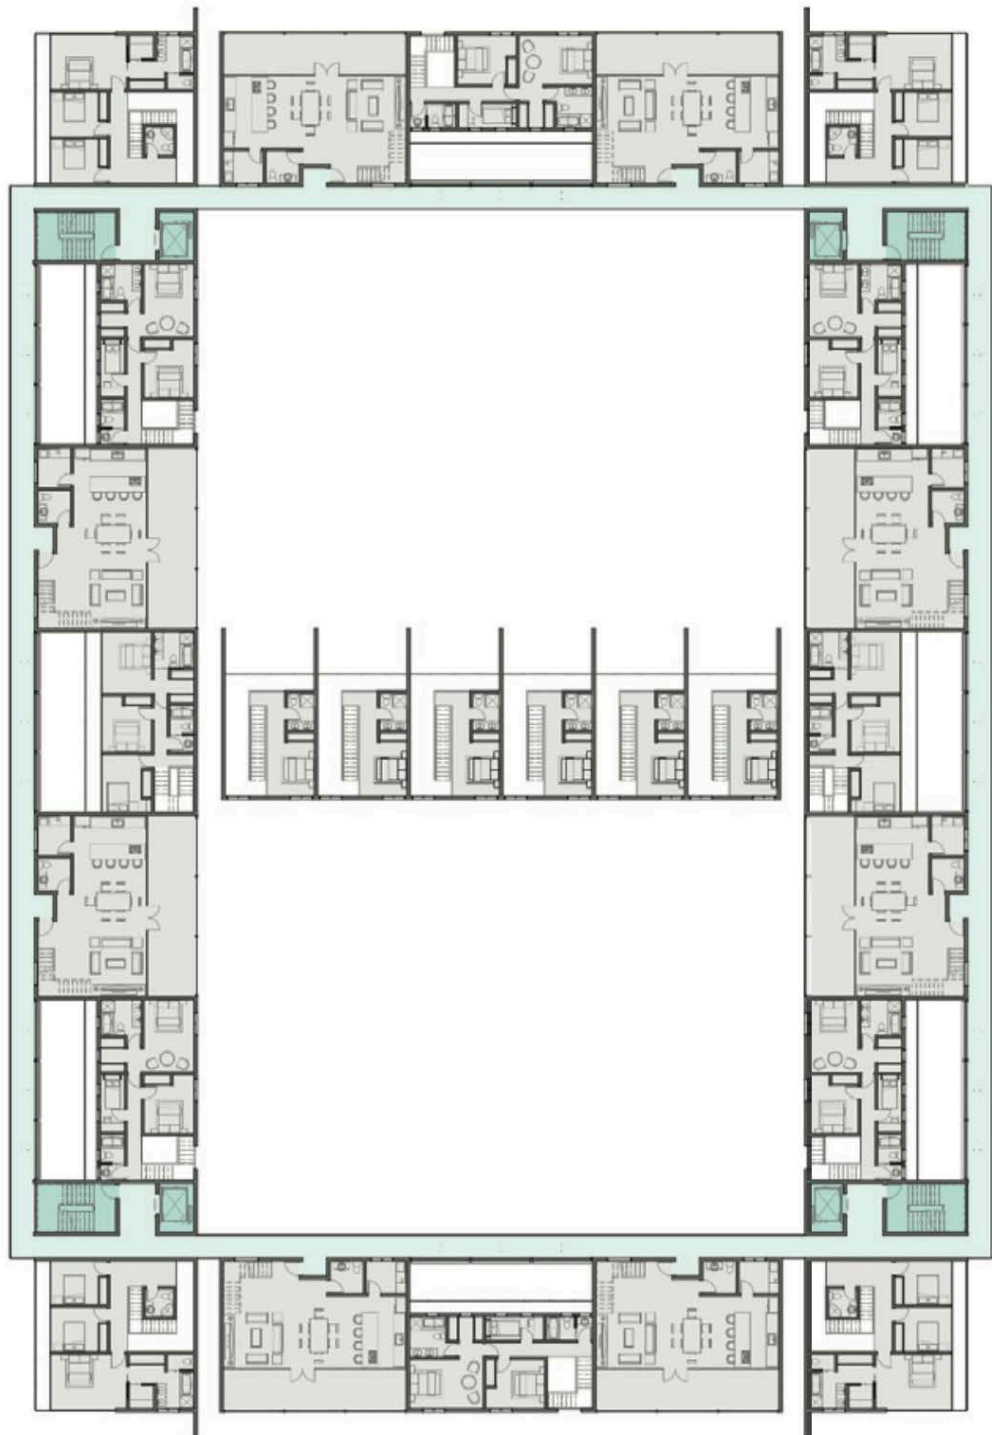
Floor plan of the 2nd, 4th an 6th residential levels
